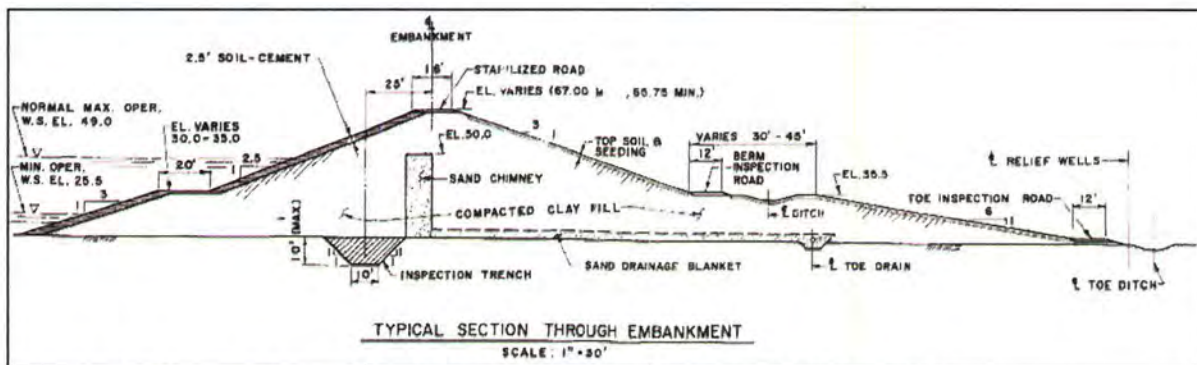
Cross section of the MCR embankment levee (provided by STP)
